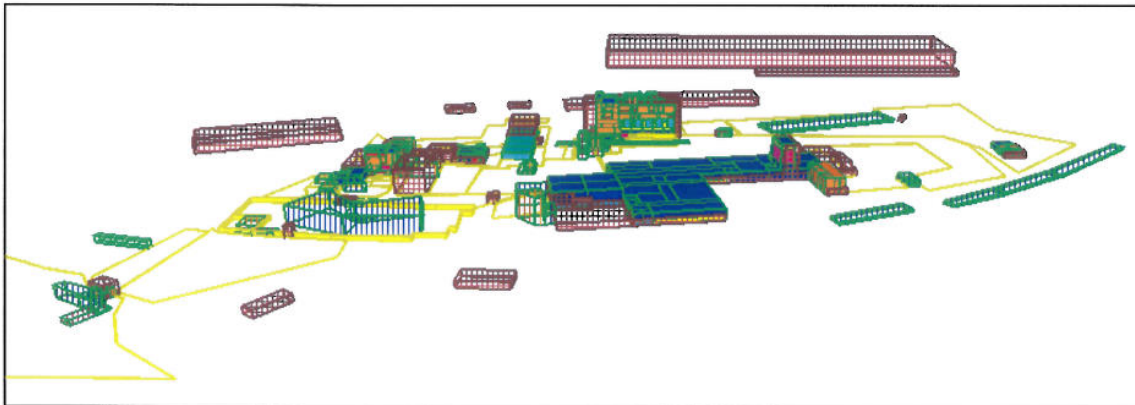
3-D View of Buildings and Zones of Congestion and Confinement
